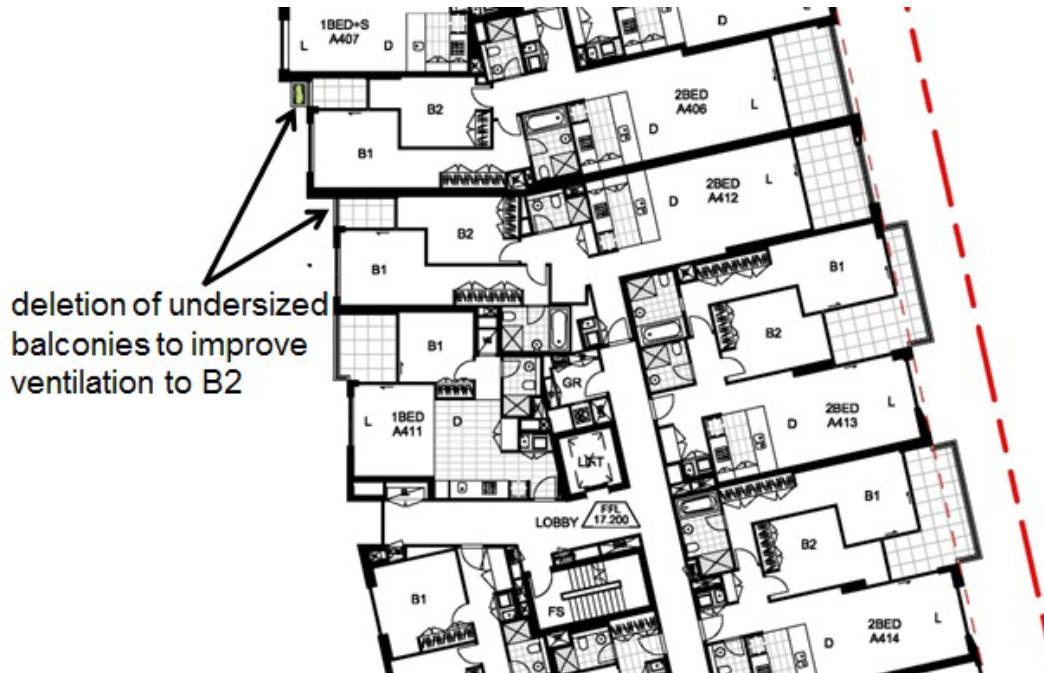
deletion of narrow balconies to improve daylight and ventilation to bedrooms
